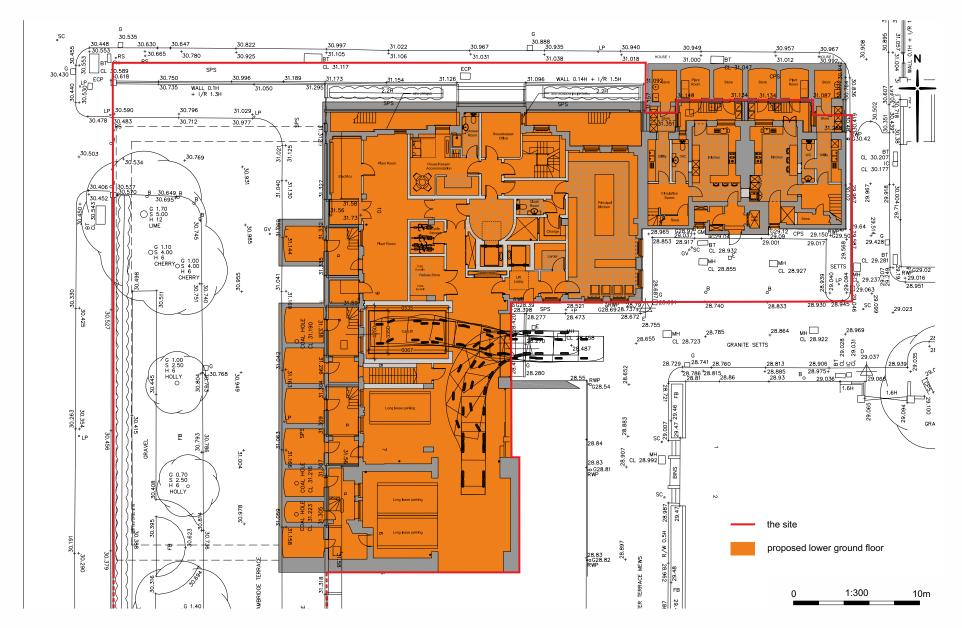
Proposed Lower Ground floor (Moxley Architects Ltd drwg 639-2.002 dated November 2008)
